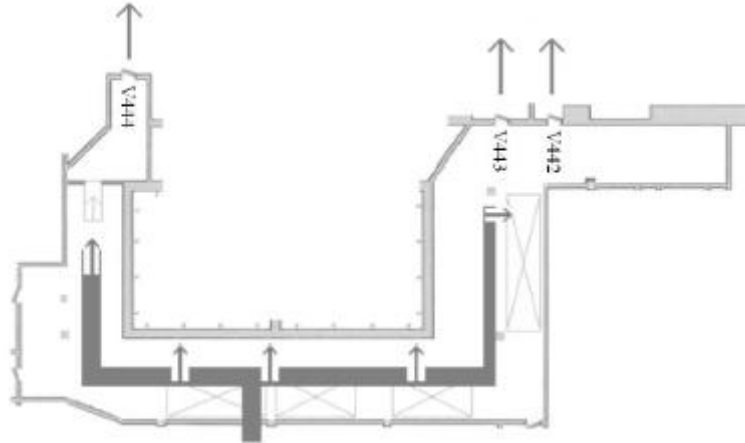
A schematic drawing of the ventilation system. Ventilation pipe is drawn in dark grey colour. The fire dampers are indicated by labels V442, V443 and V444. The ventilation pipe and the air terminals are located at a height of 3 m above floor level. (Figure by T.Purho, TVO)
